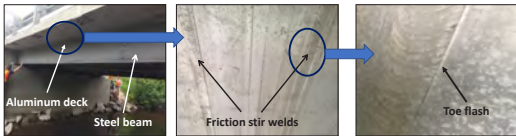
Friction stir welded aluminum highway bridge deck in Saint Ambroise, Québec
